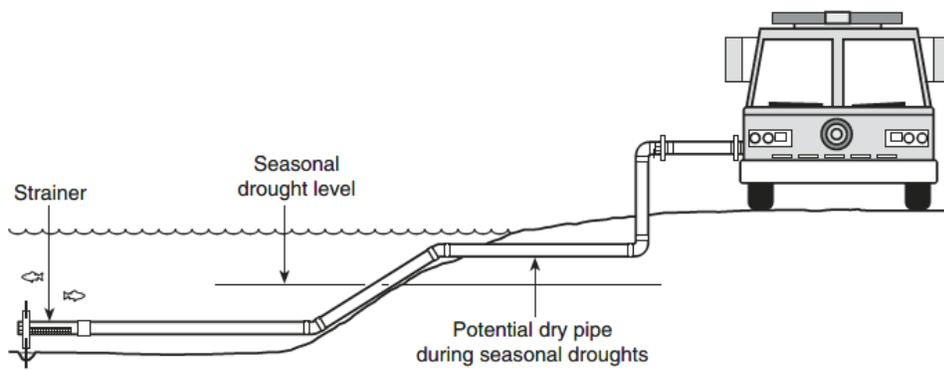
Typical Dry Hydrant Installation Showing Impact of Seasonal Drought and Freezing Conditions.
